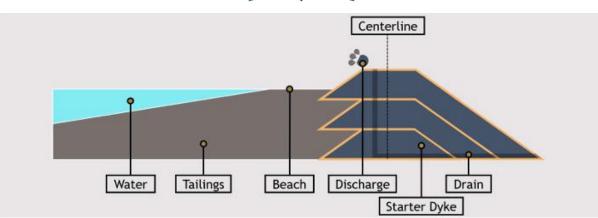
Centreline Tailing Storage Facility design (Yanama Gold, 2023)
